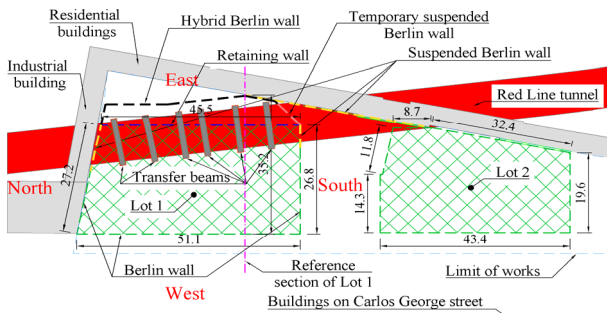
Implantation plant of the buildings of Quinta dos Candeeiros.
